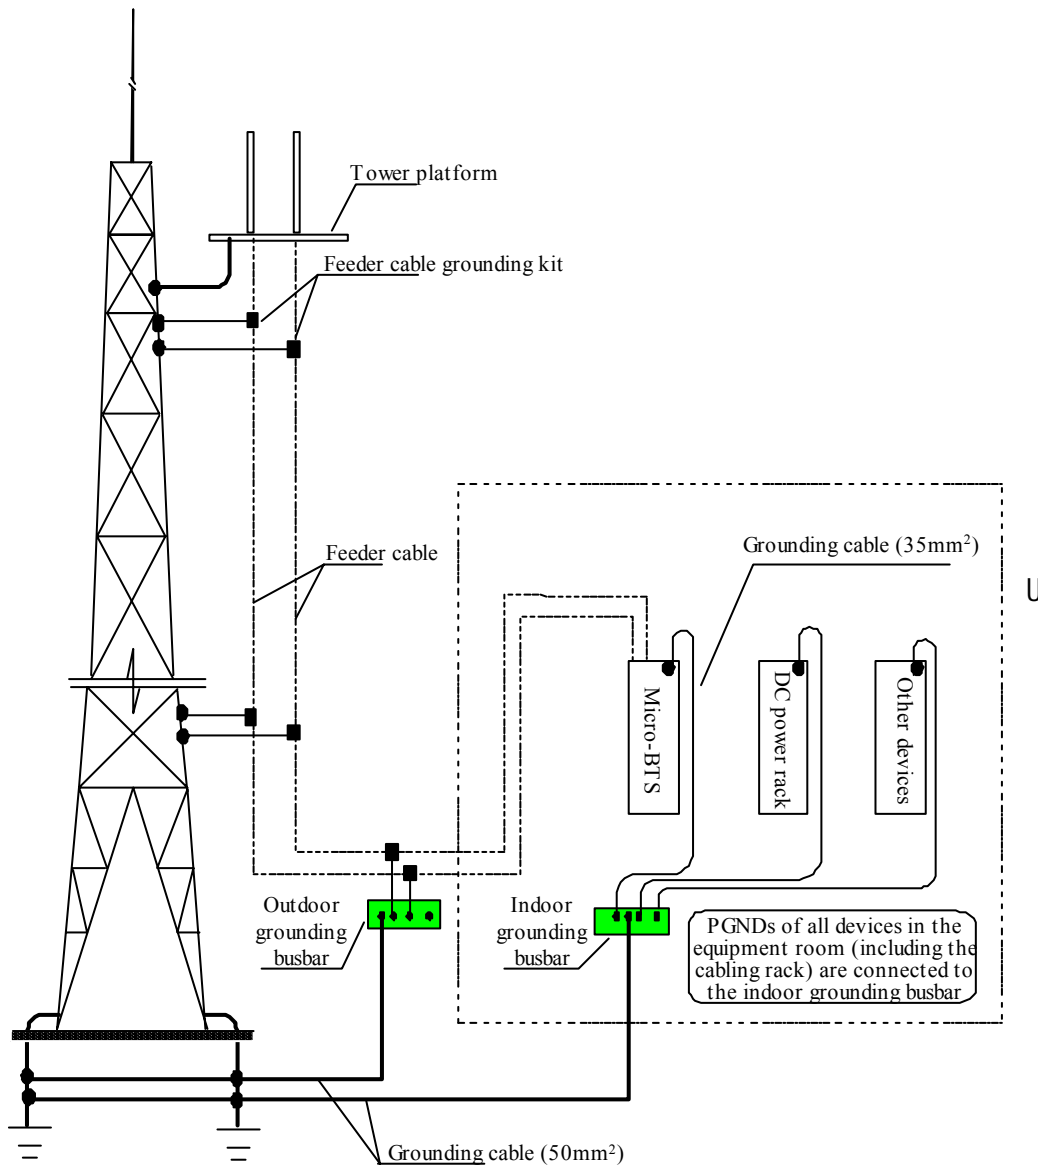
Schematic Diagram of Grounding Connections
